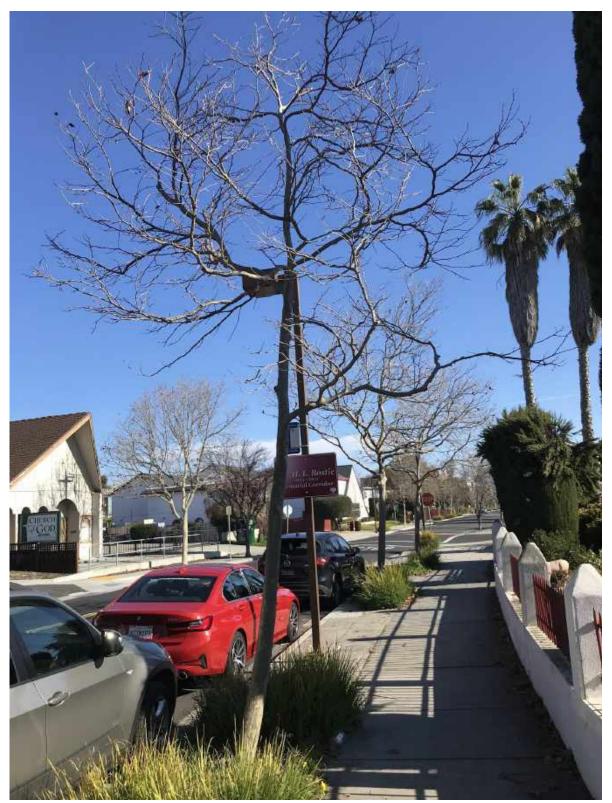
Trees #1-3 (I to r) are city street trees in good condition that will be minimally impacted by construction but should be protected with fencing around the tree wells.
